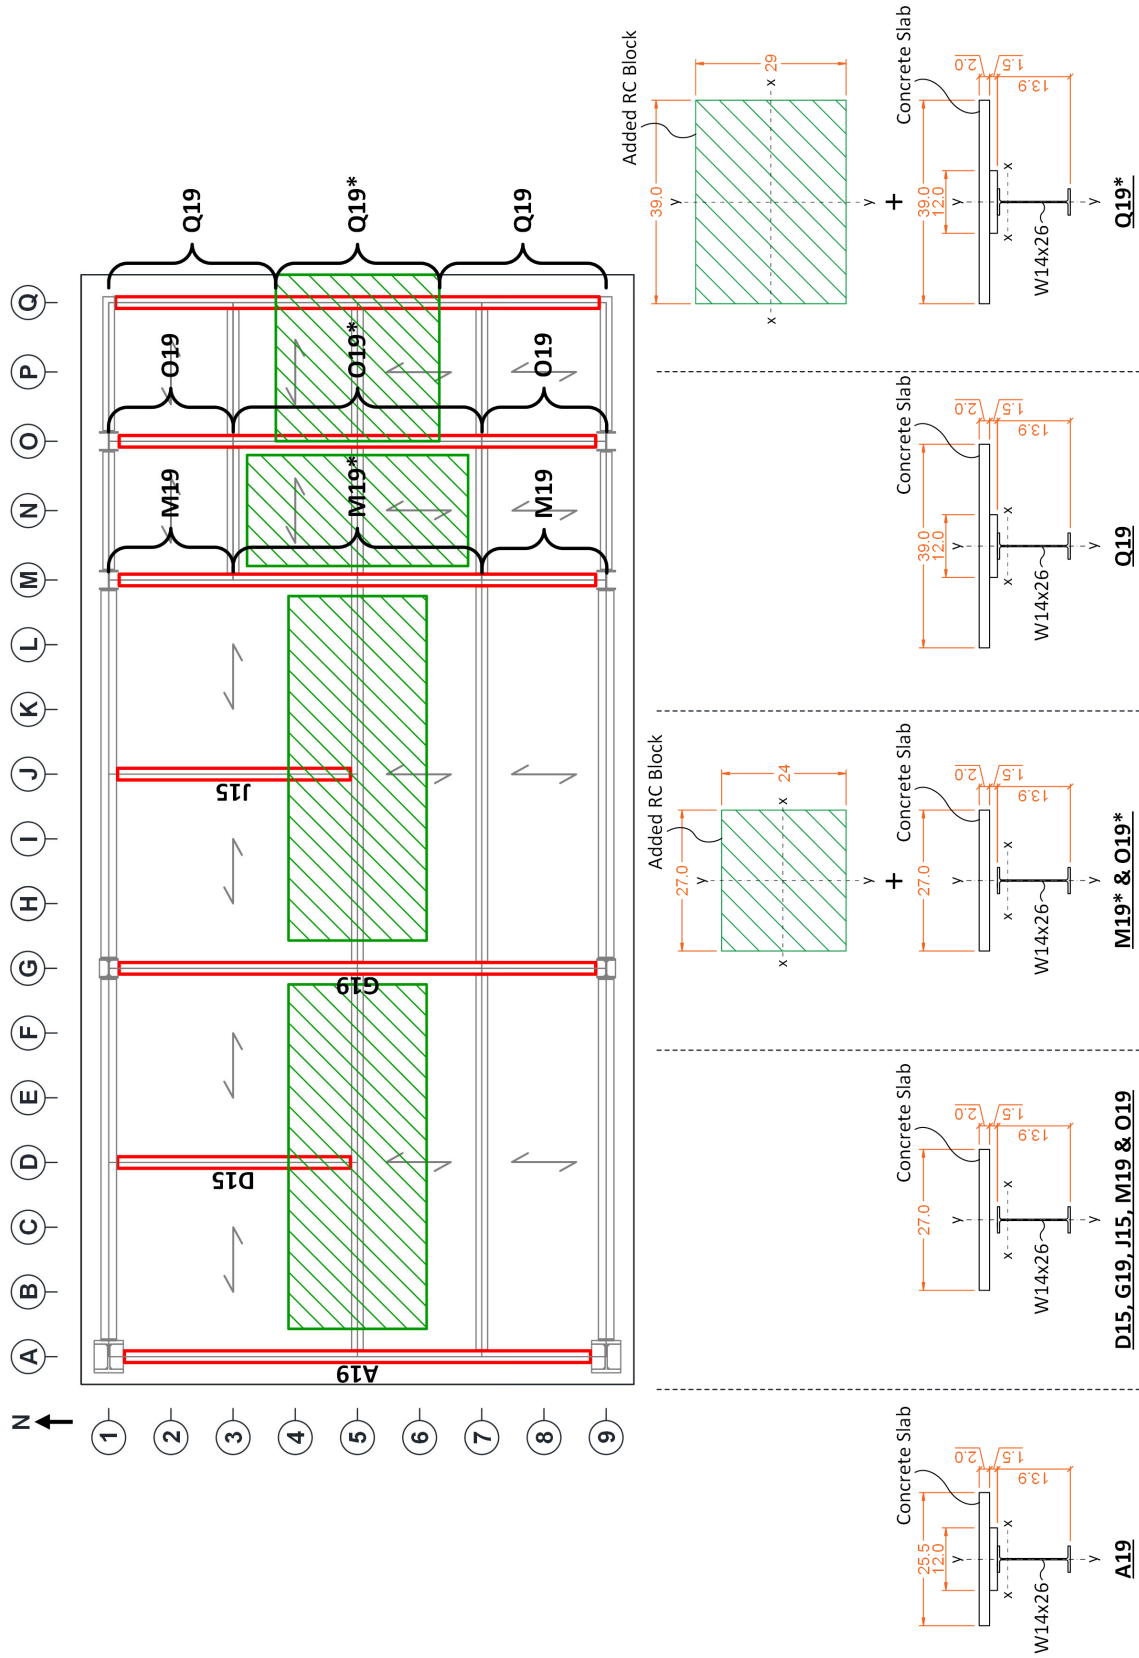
Composite Sections Transverse Beam Modeling (with Cross Sections of Added RC Block)
